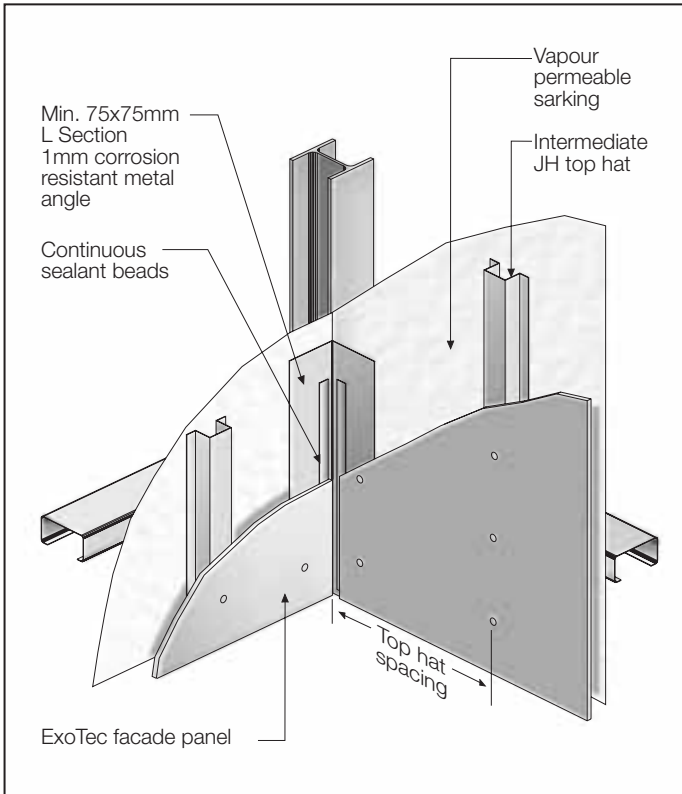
INTERNAL CORNER CUTAWAY DETAIL
